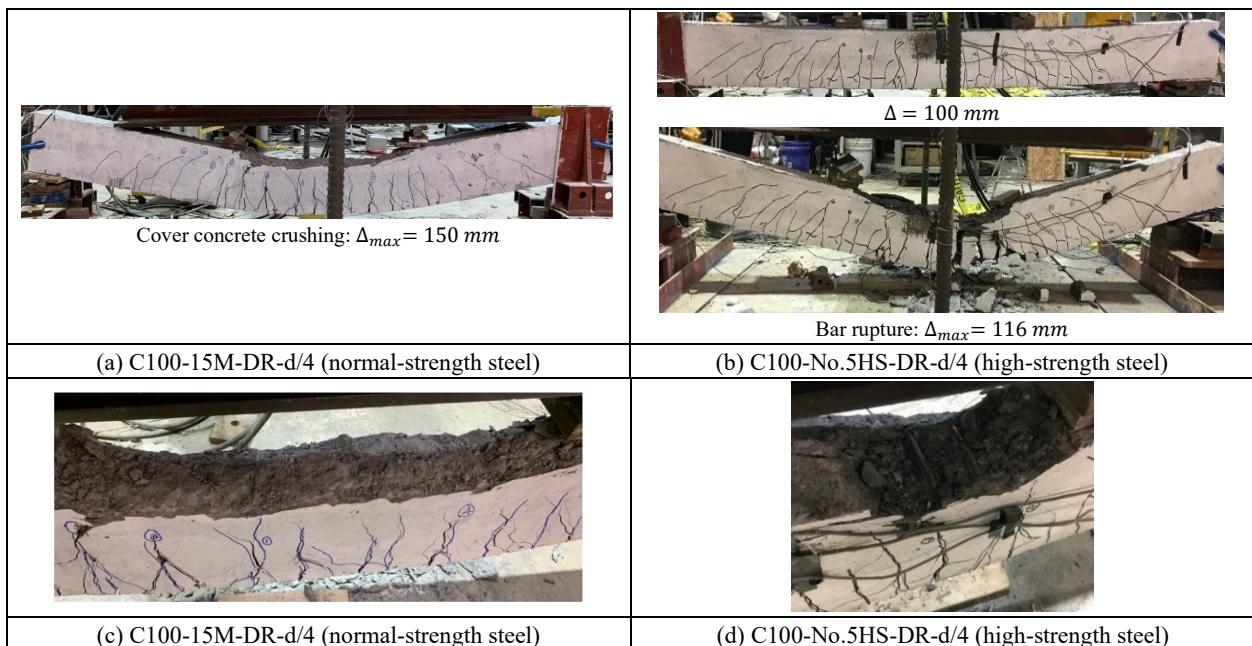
Damage/failure modes under static loading: effects of steel type
